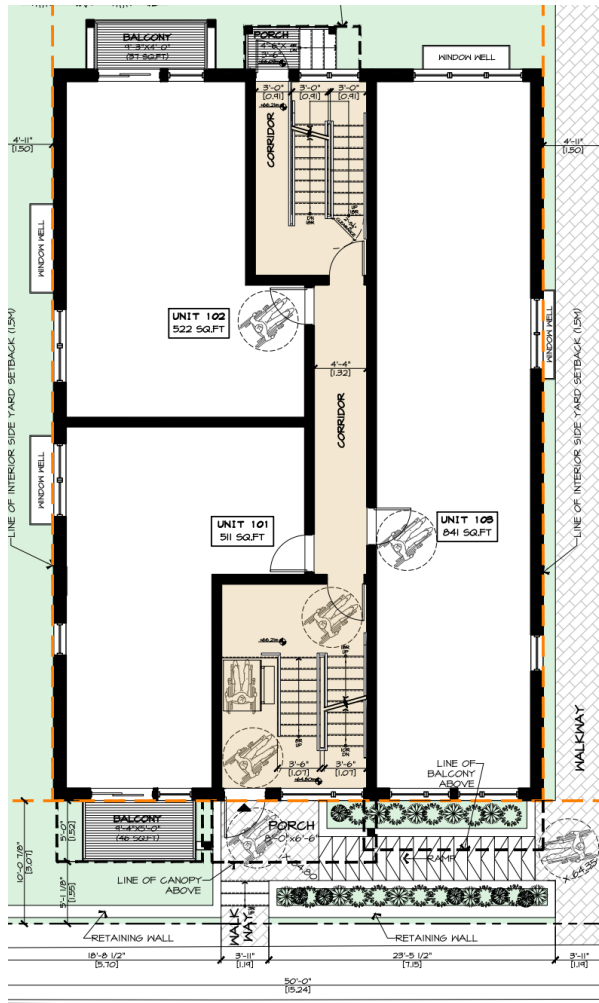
Ground Floor Plan (Wheelchair Accessibility)
